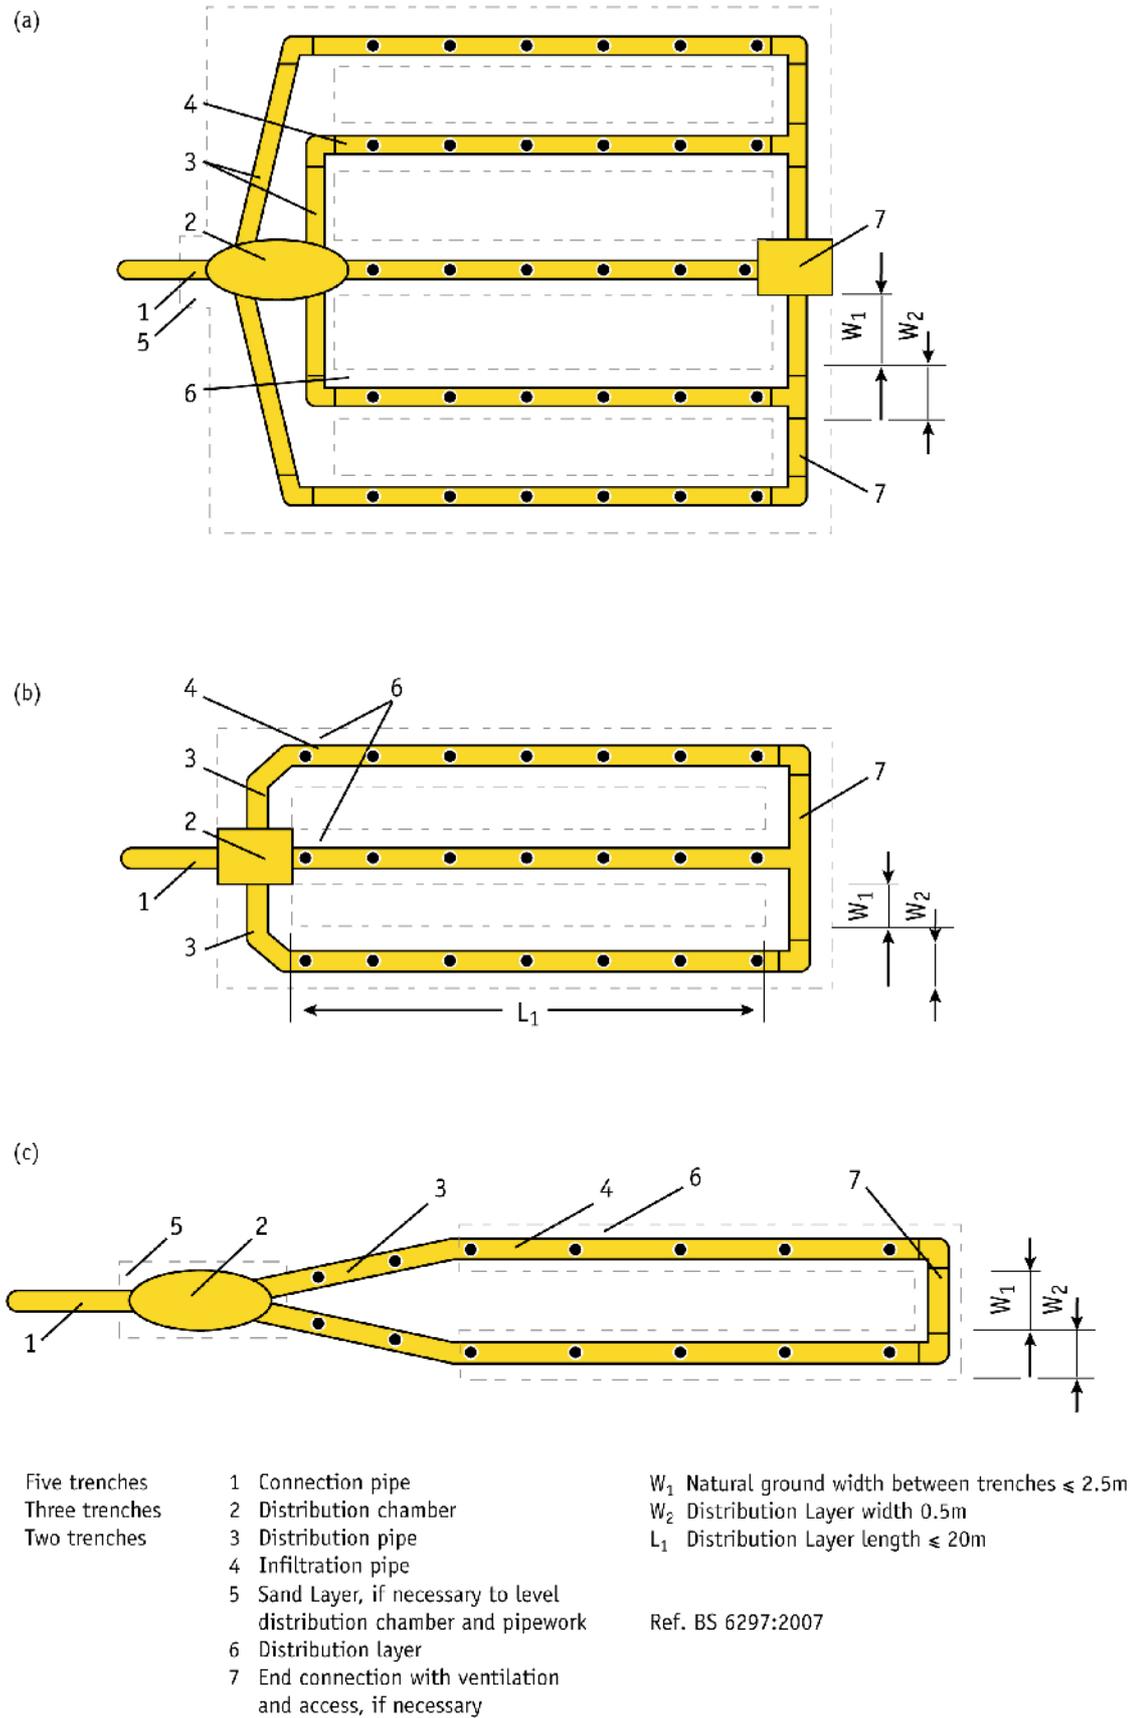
INFILTRATION TRENCHES – LAYOUT EXAMPLES.
